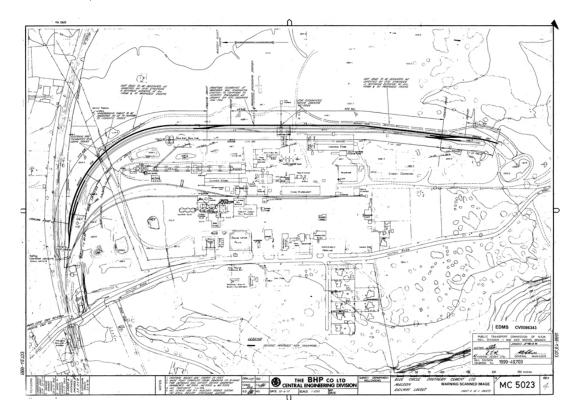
1979 plan showing layout of Cement Works and rail sidings (Source: RailCorp Plan Room).
